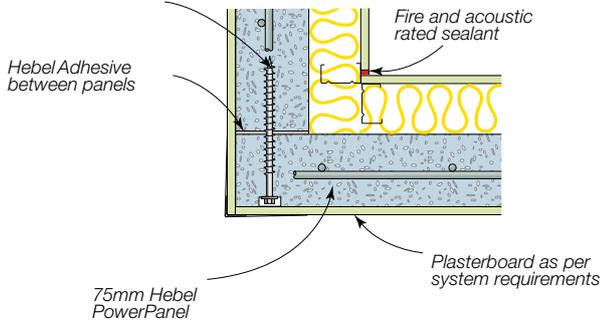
Walls to column junction - Intertency Walls or Common Walls Option 1 for H > 3100mm
